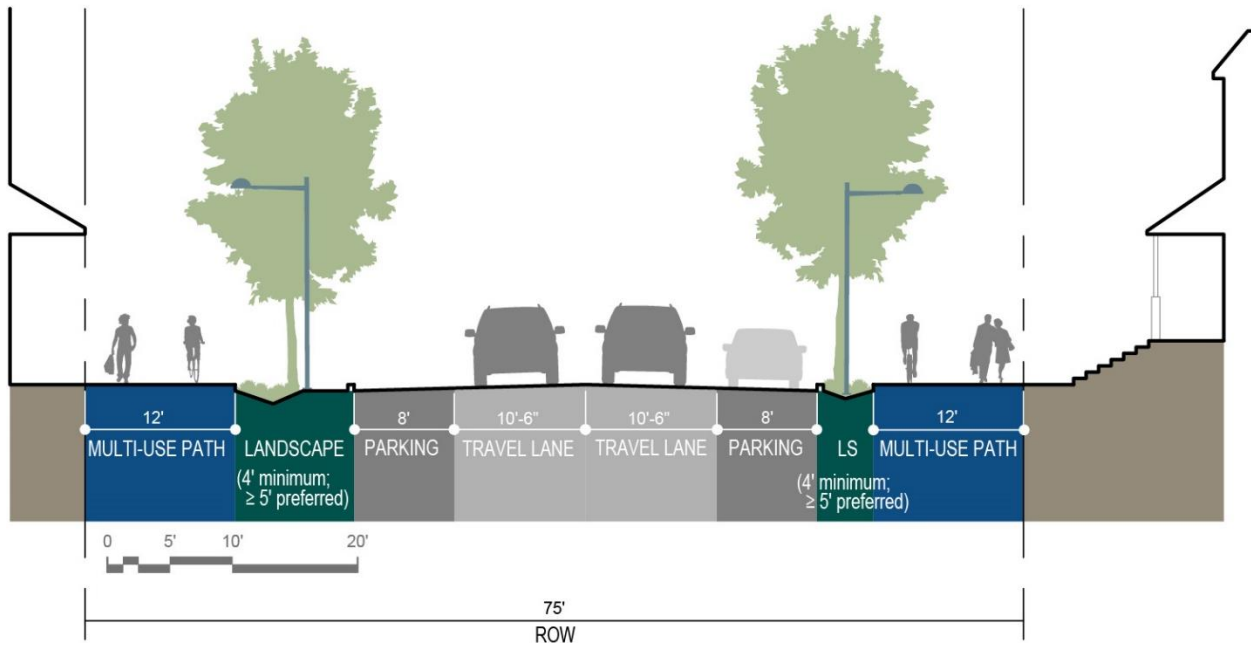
Proposed cross-section – 8th St from Ash Ave to 47th Ave (looking west)
